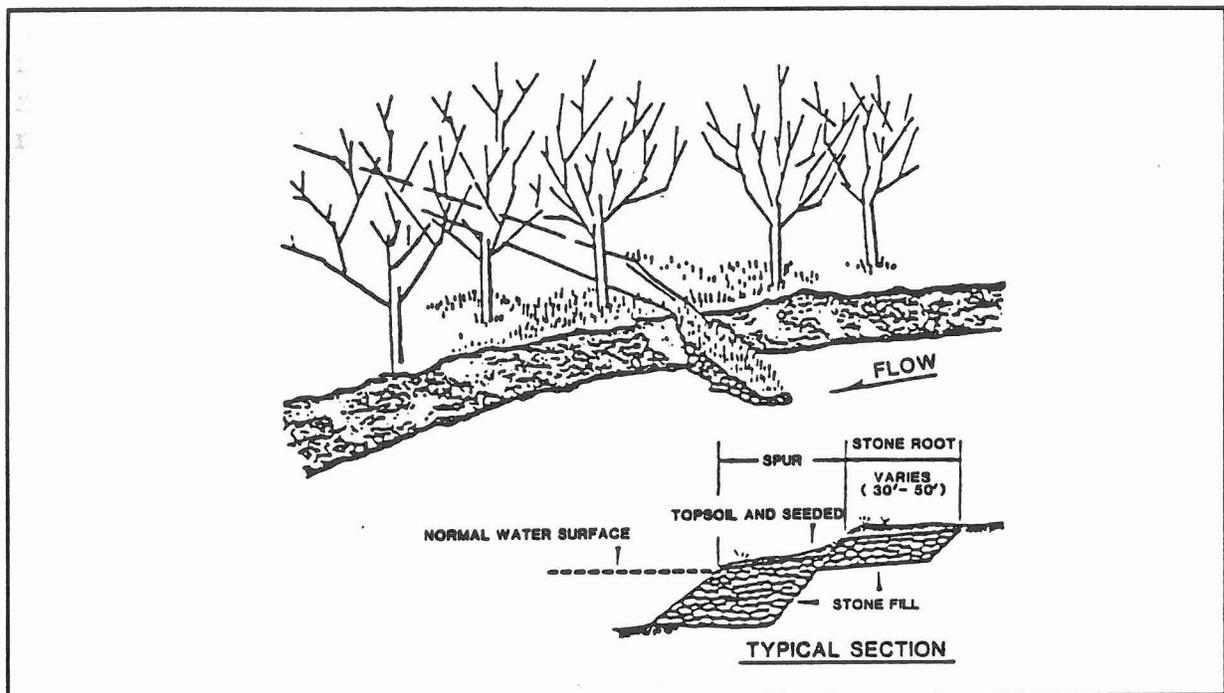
Perspective view of hardpoint installation with section detail (After [37]).
